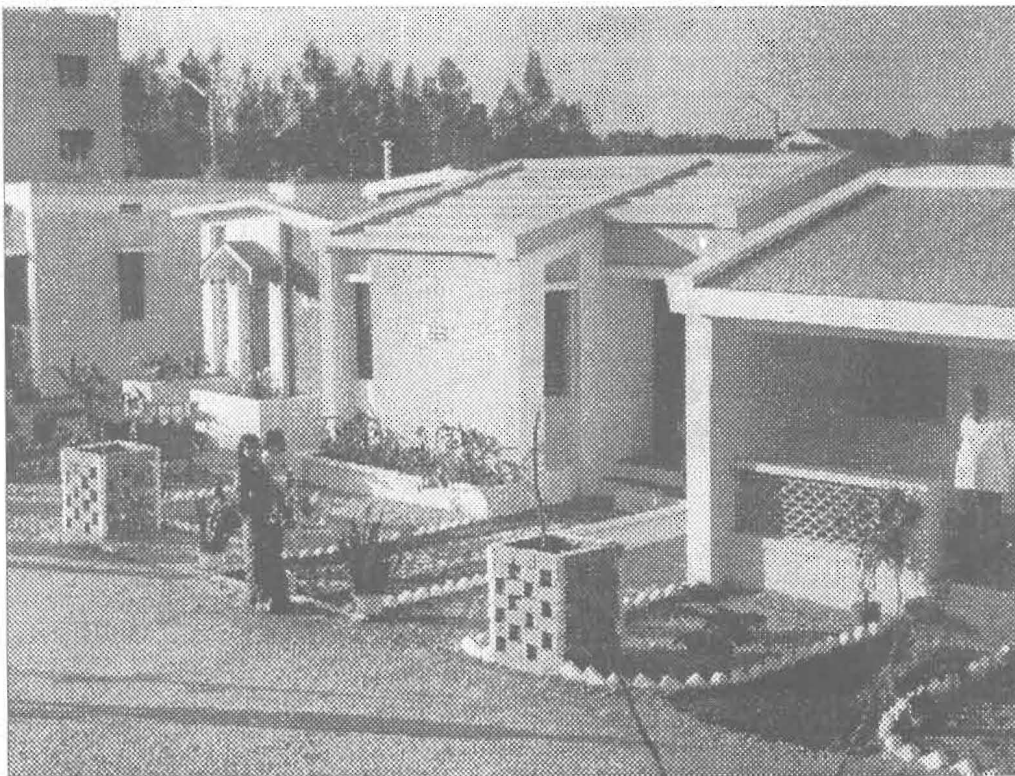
Demonstration Low Cost Building at Madras with L-Pan Roofing
